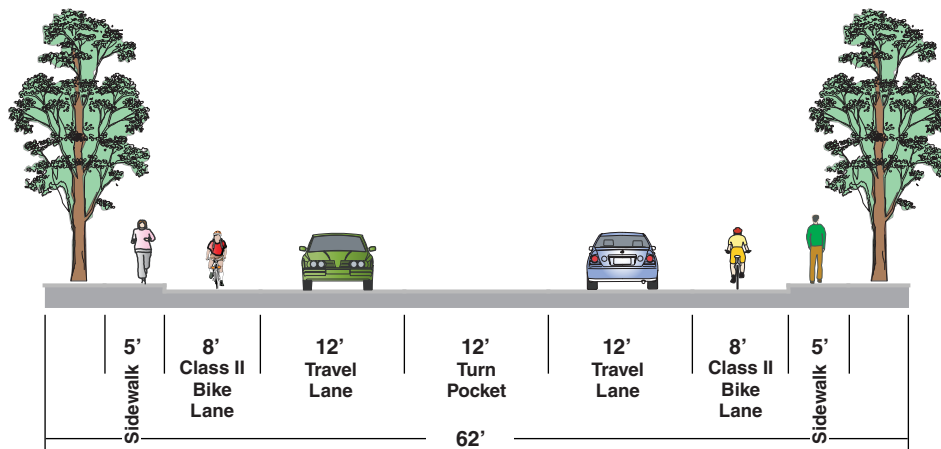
Eastside Parkway - Typical Two Lane Street Section with Sidewalks and Left-Turn Pocket
